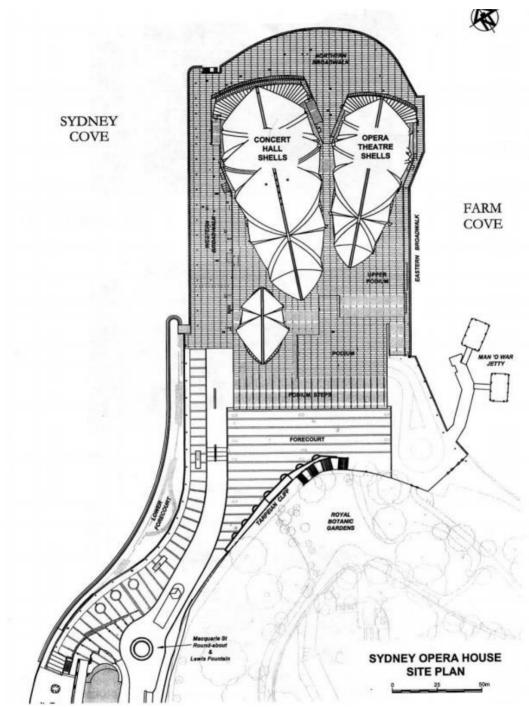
Sydney Opera House Site Plan (Source: SOH Conservation Management Plan)
